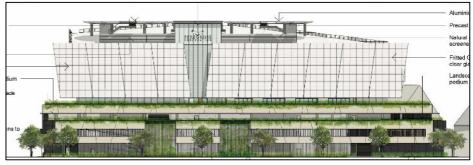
Proposed Bowen Street Elevation, showing lowered lourves with framed helipad and concrete slab to rooftop.
